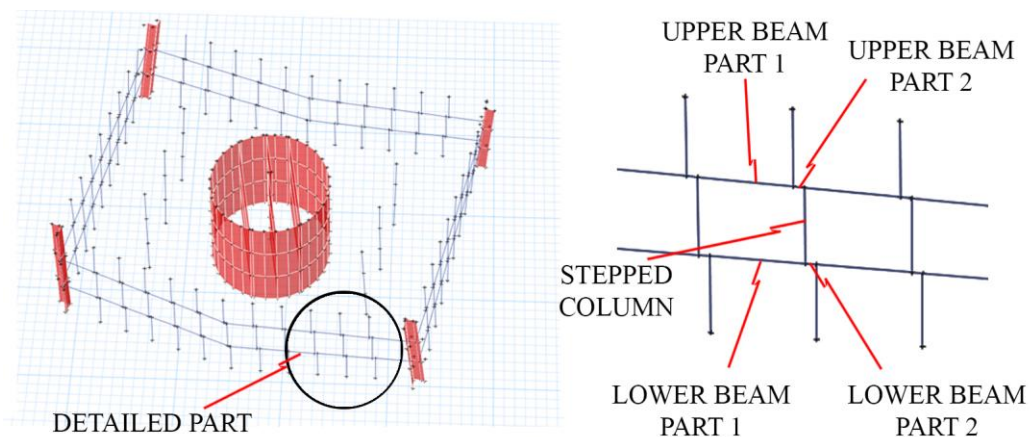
Modelling detail of stepped perimeter column (twisting model)
